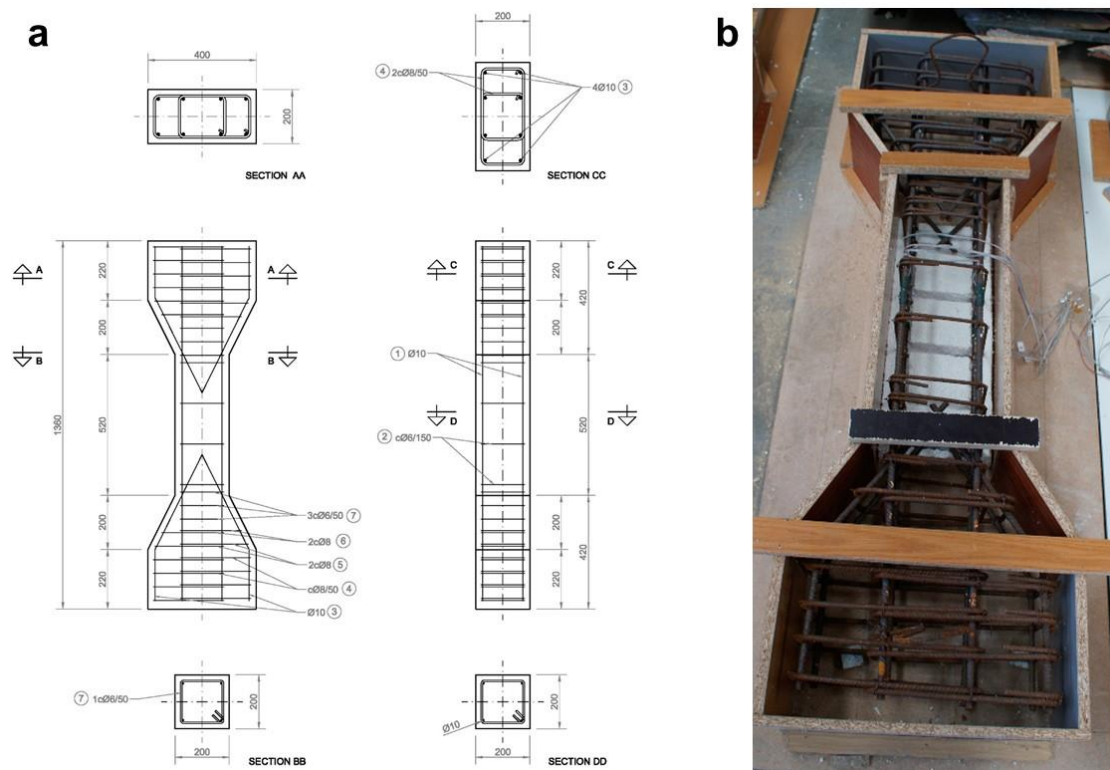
a) Specimen geometry and reinforcement (in mm); b) Specimen contained by formwork.
